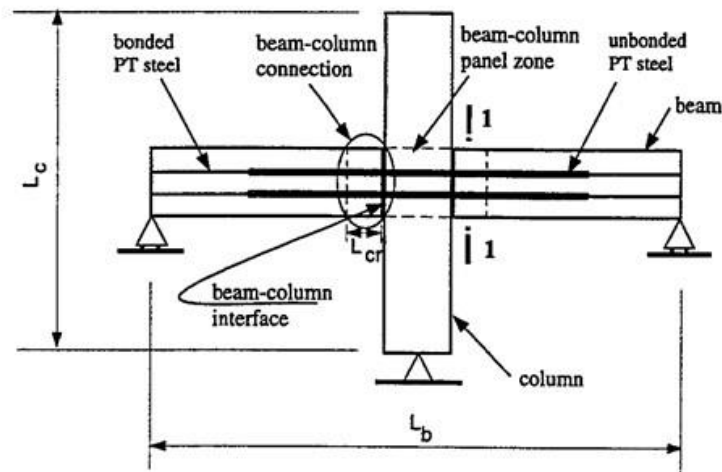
Unbonded post-tensioned pre-cast beam-to-column connection assemblage (El-Sheikh et al., 1999)
